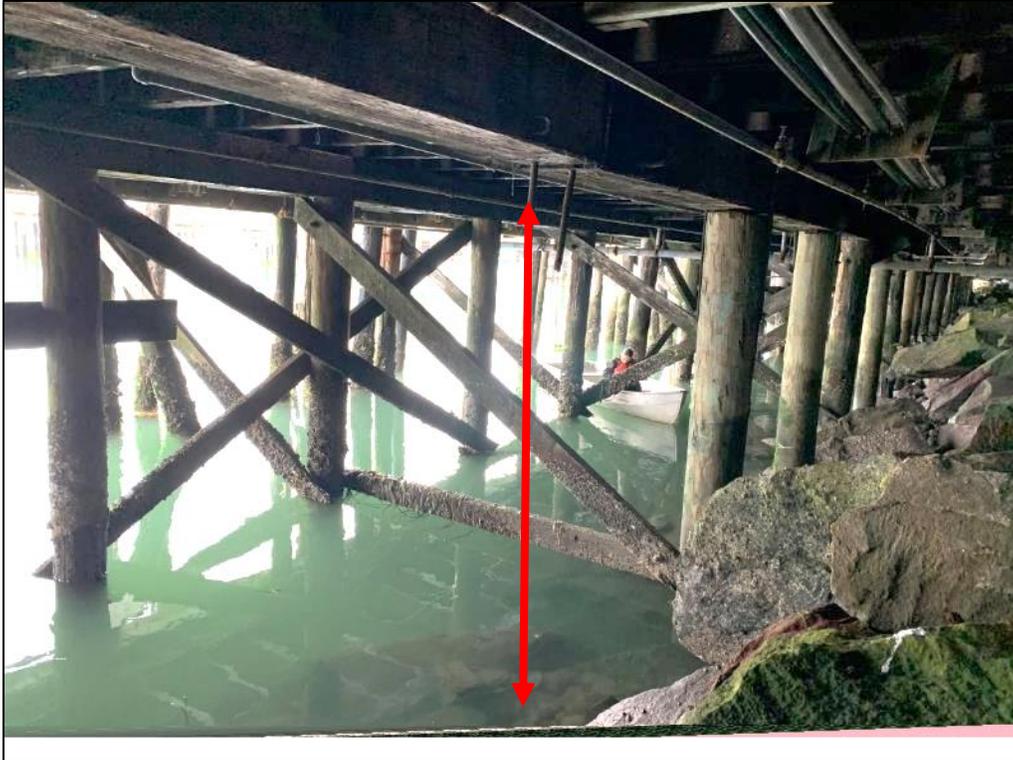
Seawall 1 STA 1+44 Missing pile (out of scope).
